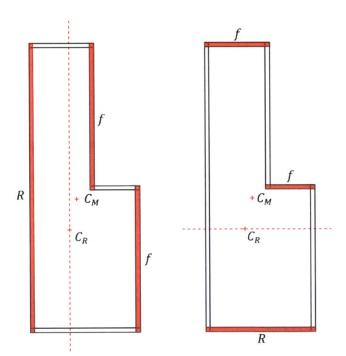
Walls are considered *flexible*, f, if they are on the same side of the building plan as the center of mass, C_M , from the reference line through the center of rigidity, C_R , and as *rigid*, R, otherwise, as shown above.
